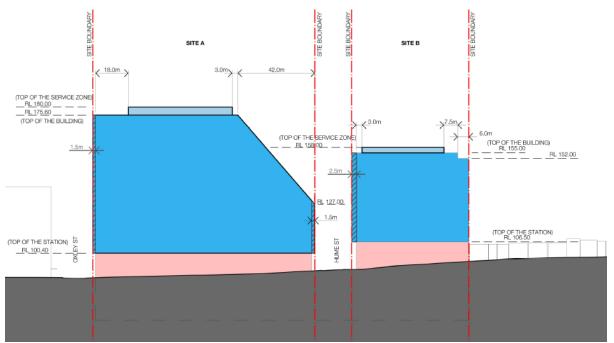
West elevation of the building envelope under the Amended Scheme, showing CSSI Approval (pink) and OSD components (blue)
